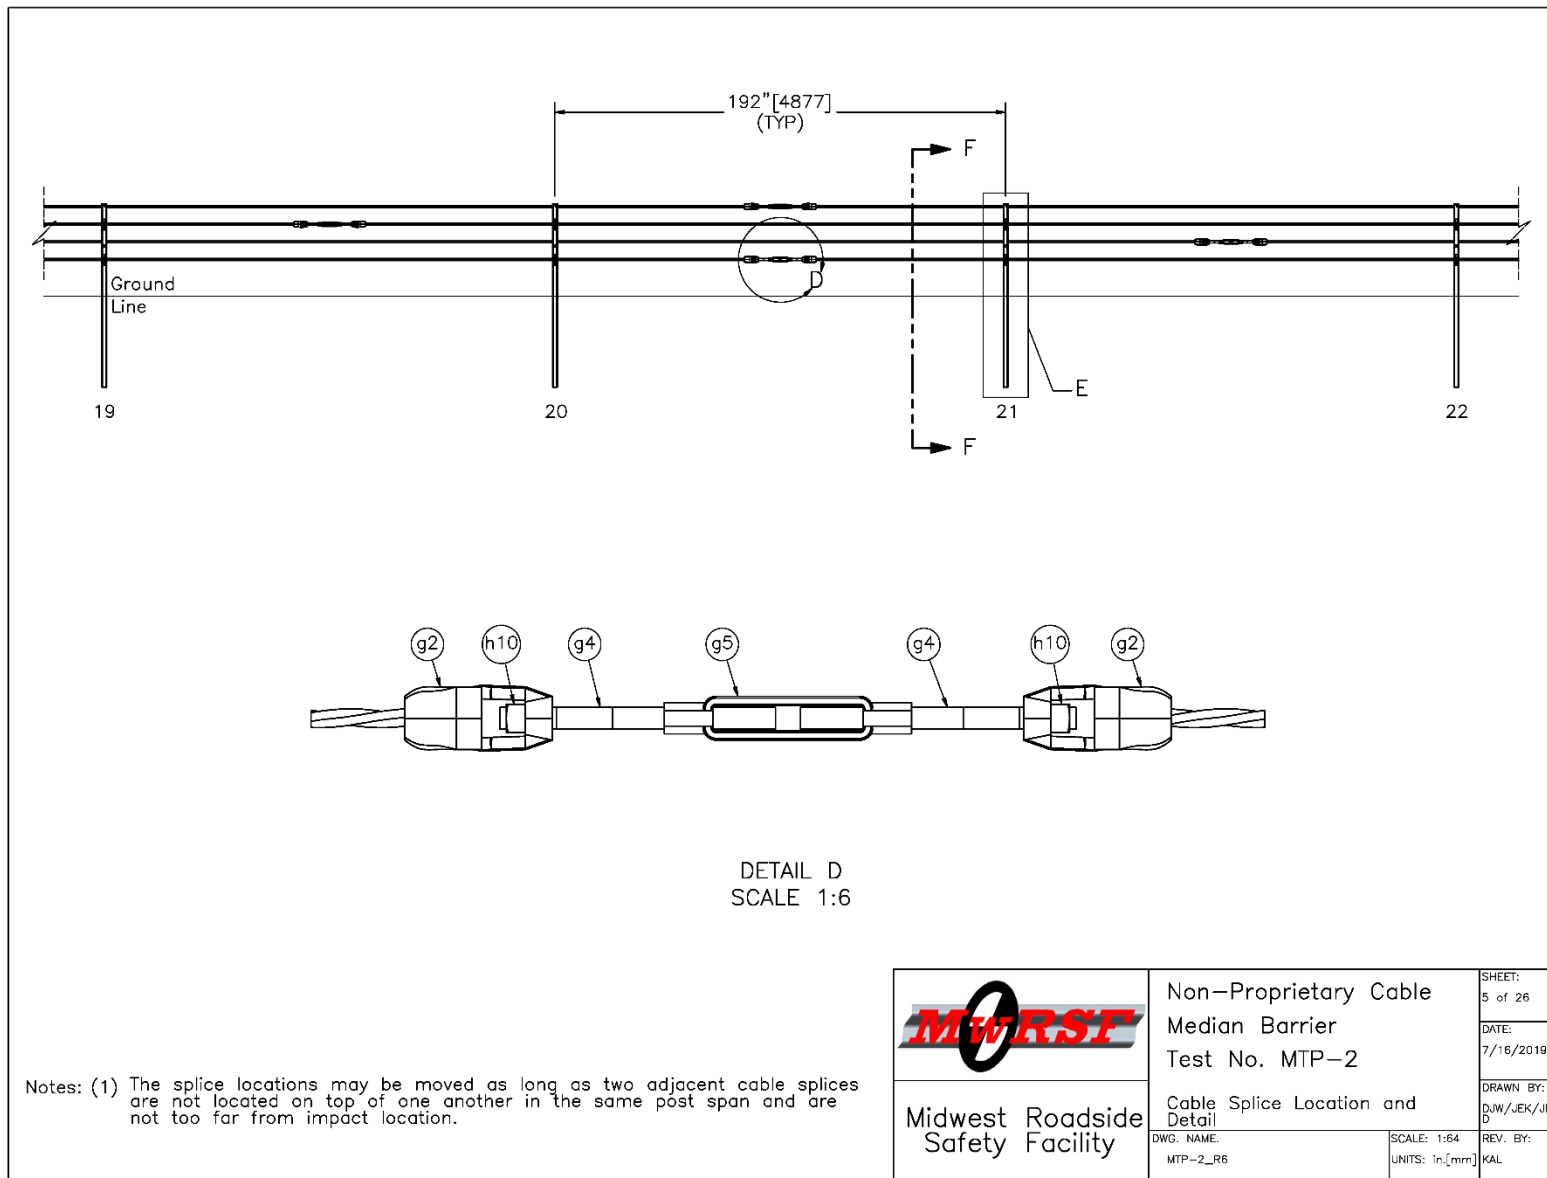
Cable Splice Location and Detail, Test No. MTP-2
